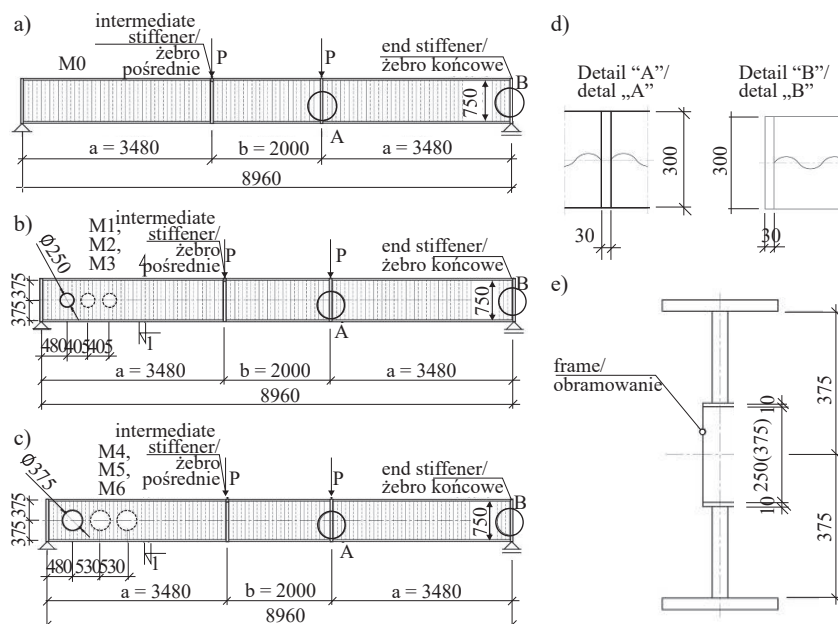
Geometrical models of girders with corrugated web: a) M0; b) M1–M3; c) M4–M6; d) stiffeners; e) cross-section 1–1
